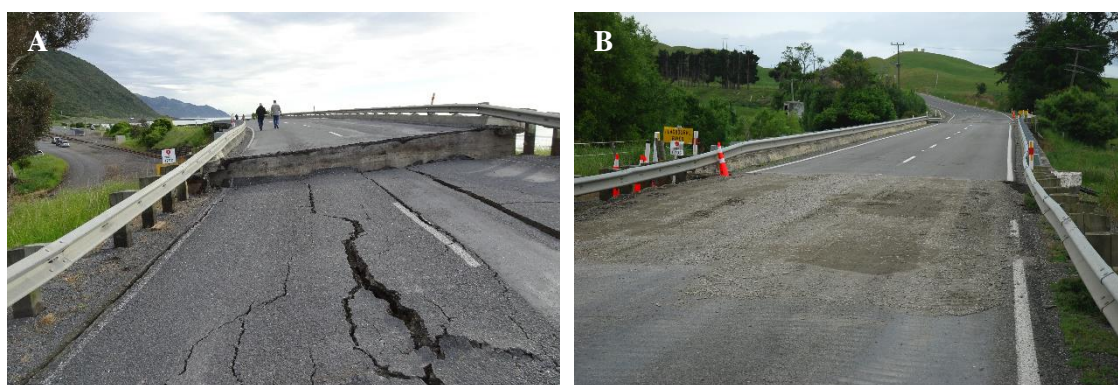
Examples of damage to bridges affecting road access. (A) The state highway overbridge at Oaro was closed due to >0.5 m of settlement at the approaches. (B) Access across bridges with less severe settlement was able to be quickly reinstated with temporary ramps.
